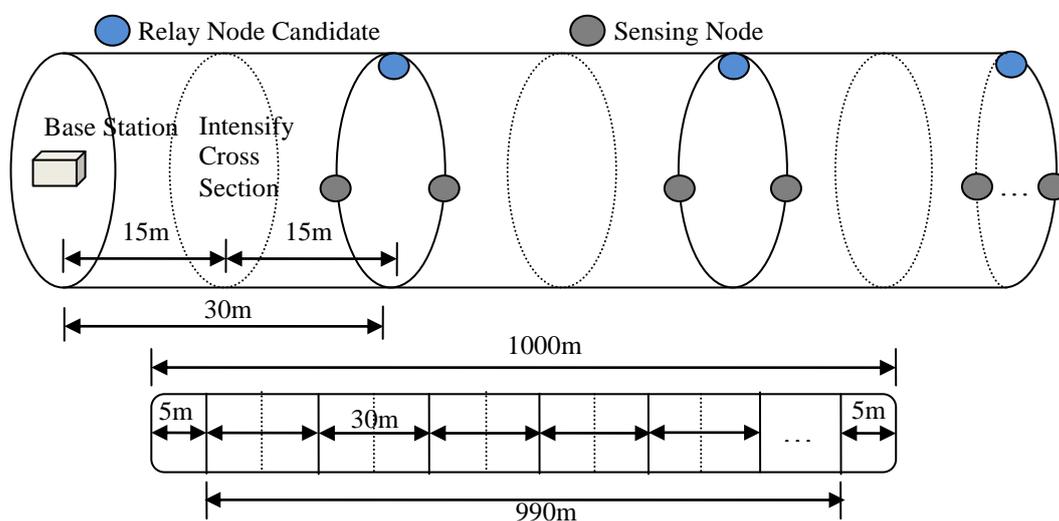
Proposed deployment scheme for typical Shanghai interval subway tunnel
